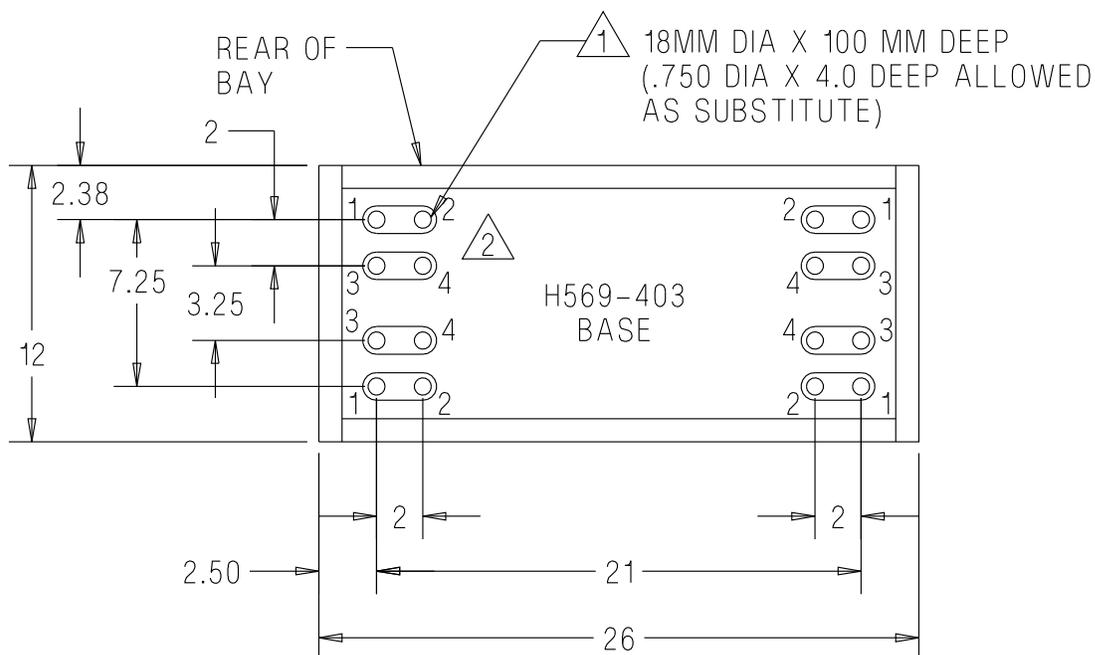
Floor Mounting Template (All Dimensions Are Given in Inches)
